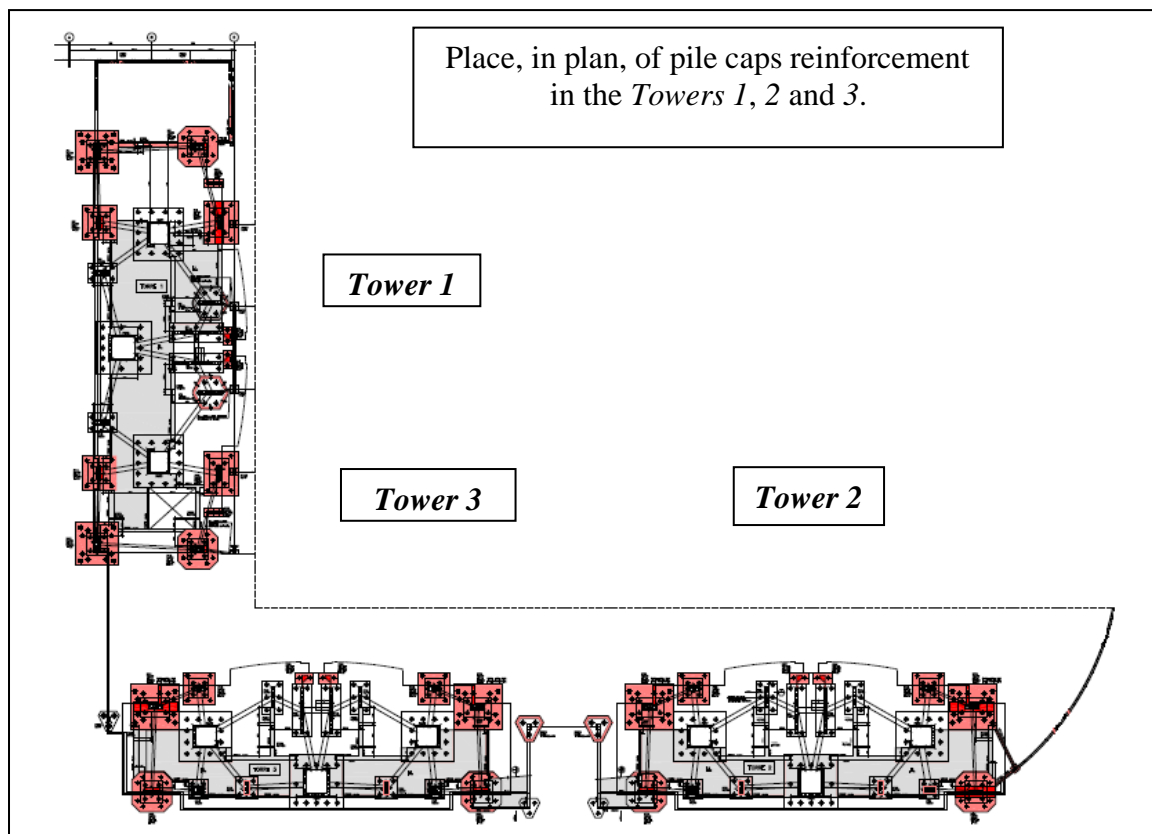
Location detail, in plan, of pile caps structural reinforcement in the residential towers.
